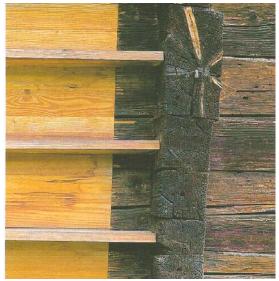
Exterior Wall Detail, Gugalun House (Zumthor)
